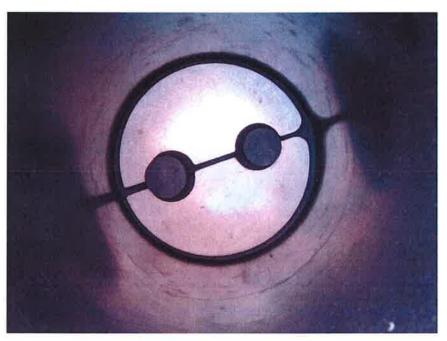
View - underside of the test setup; Liner pipe ZVR DN 100 with annulus gasket HRD 100 and filler plug
